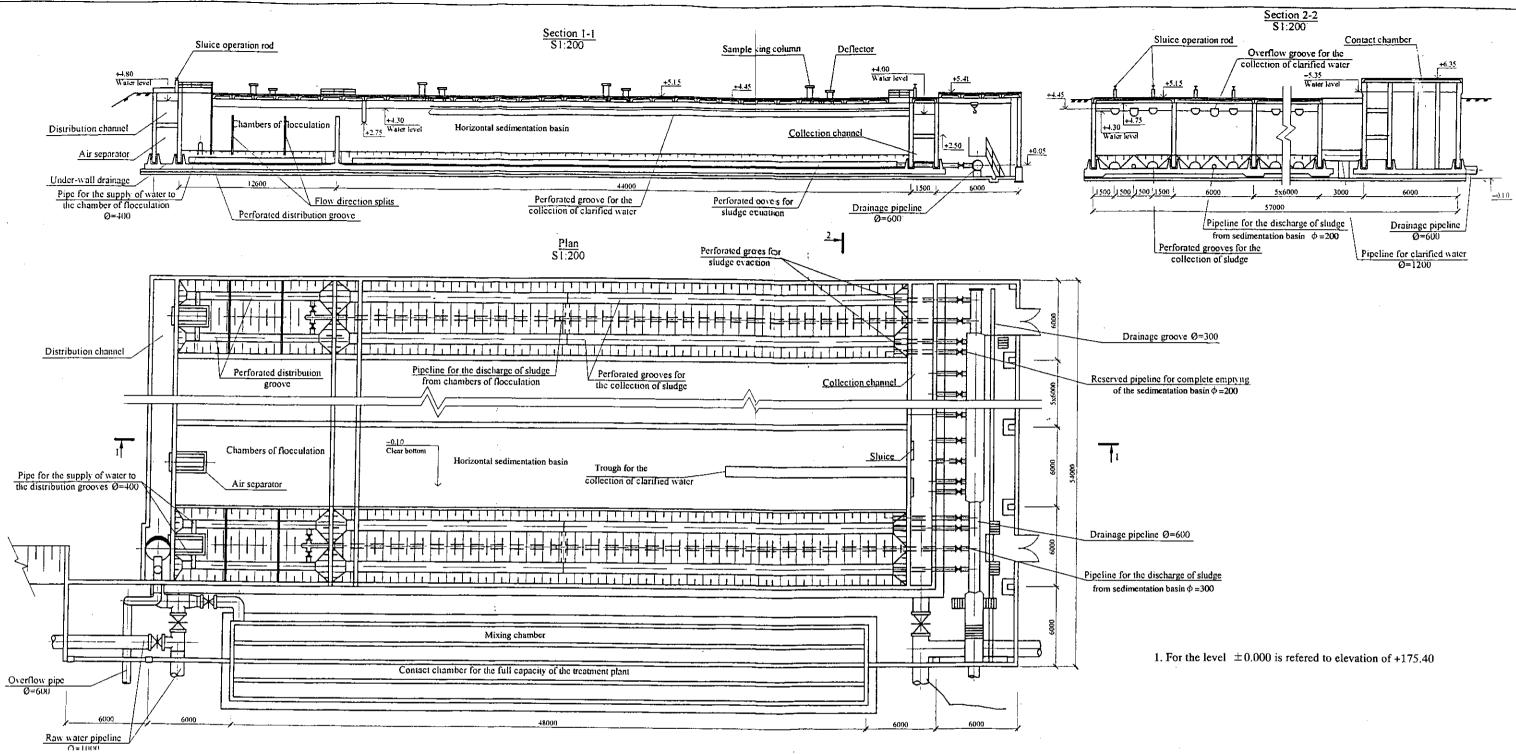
Plan of Apa-Canal Soroa-Balti Water Treatment Plant
